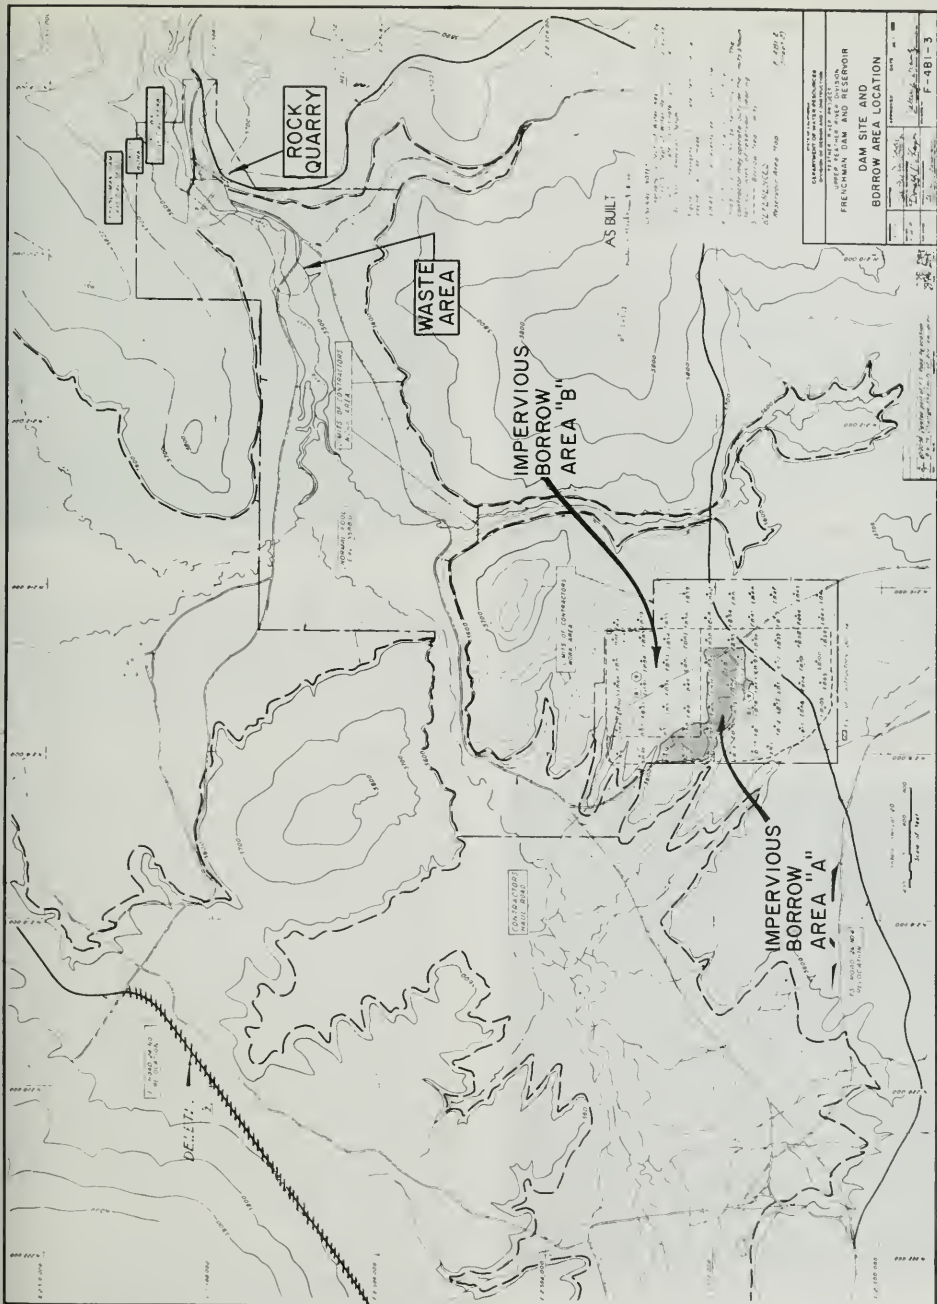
Location of Borrow Areas and Frenchman Dam Site
